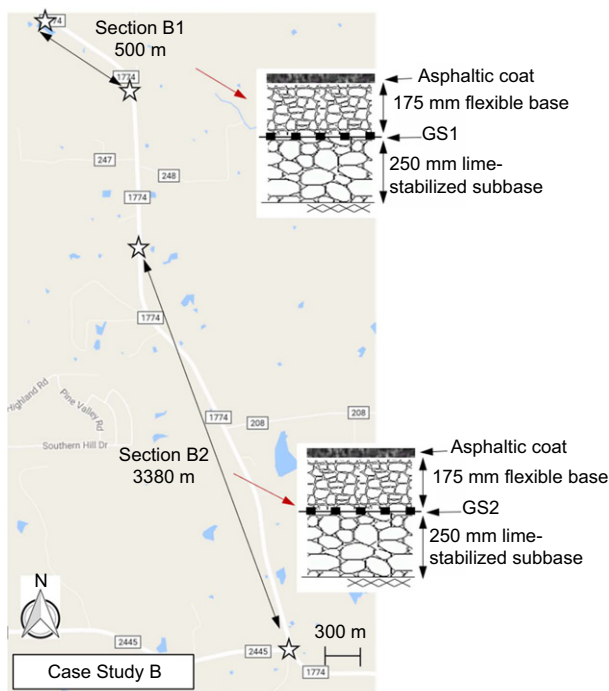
Layout of FM1774 test sections and corresponding road profiles (Case Study B)
